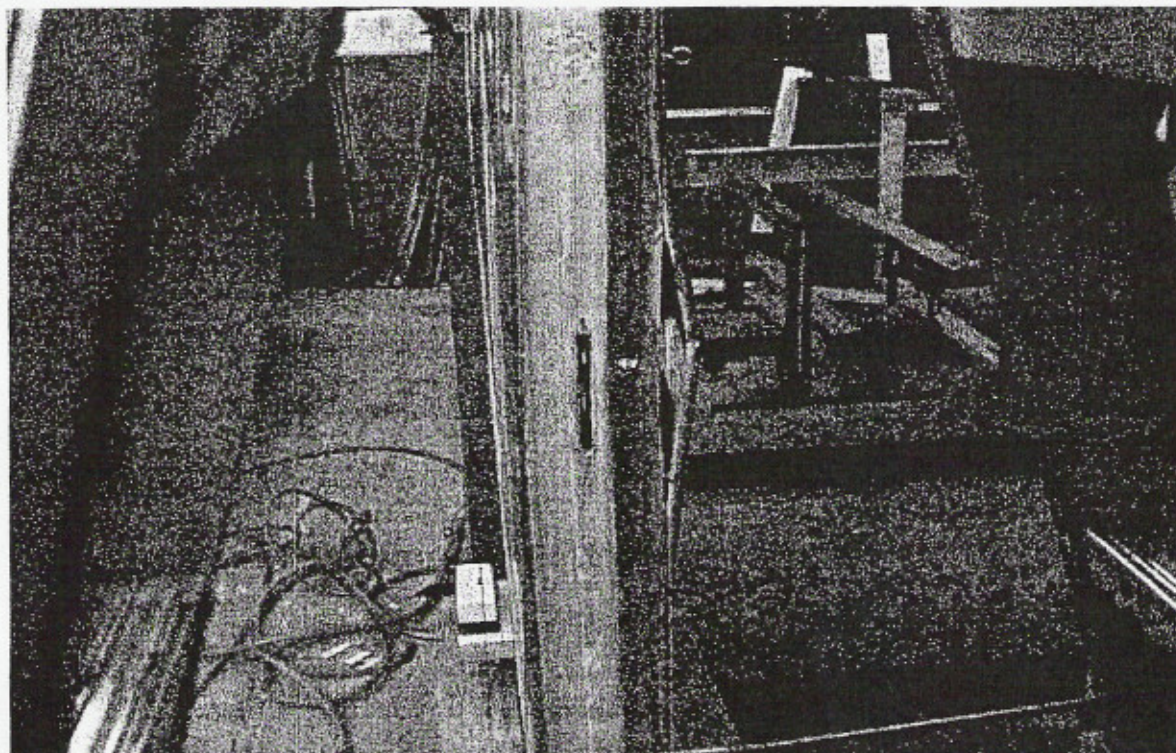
Failure of 8' Galv.-Galv. Panel Under Compressive Loading
